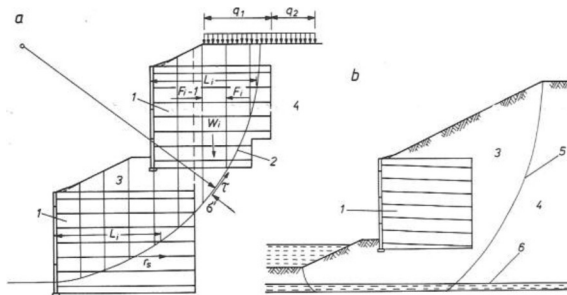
Scheme of general stability control [6, 13]: *a* – damage along the cylindrical surface, *b* – individual example of massif’s destruction, under which, there is a weak layer in the substrate, 1 – reinforcement soil massif, 2 – circular line of massif’s destruction, 3 – the zone affected by destruction, 4 – the zone outside of destruction, 5 – (non-circular) line of massif’s destruction, 6 – weak layer in the substrate, σ , τ – normal and tangential strain gauging acting on the surface of damaged massif, F_i – strain gauging present in the reinforcement layers cut by the damage surface, L_i – distance from the curtain wall to the point of intersection of the reinforcement layer by the damage surface
